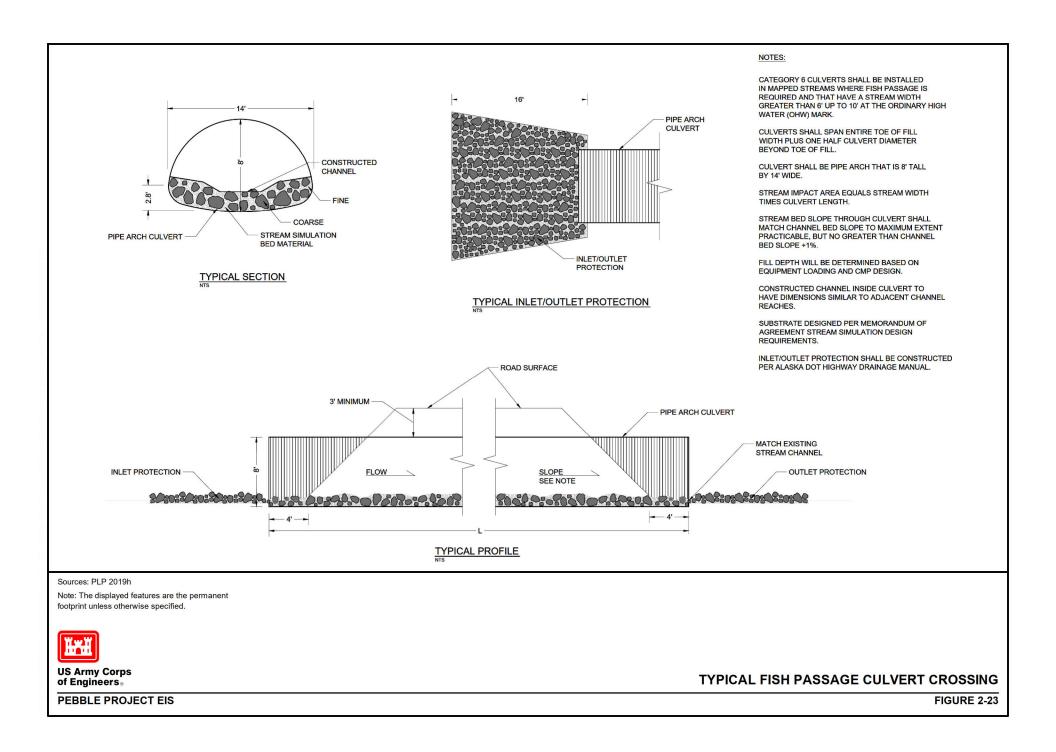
, Figure 2-22, and Figure 2-23 depict typical waterbody crossing structures. Plan, profile, and typical section drawings for each bridge crossing as well as the various categories of culverts can be found in the Pebble Project Department of the Army Application for Permit POA-2017-271 (PLP 2019h).
